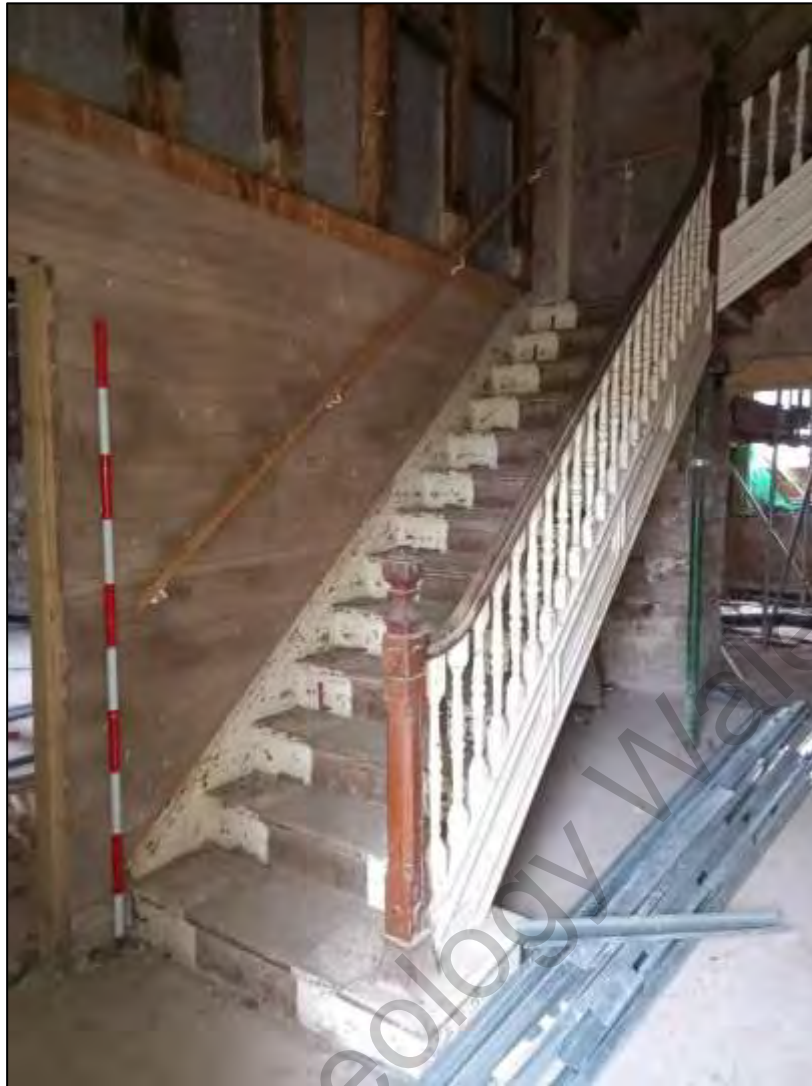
Stairs in Room 1, view south-west. Scale 2m.
